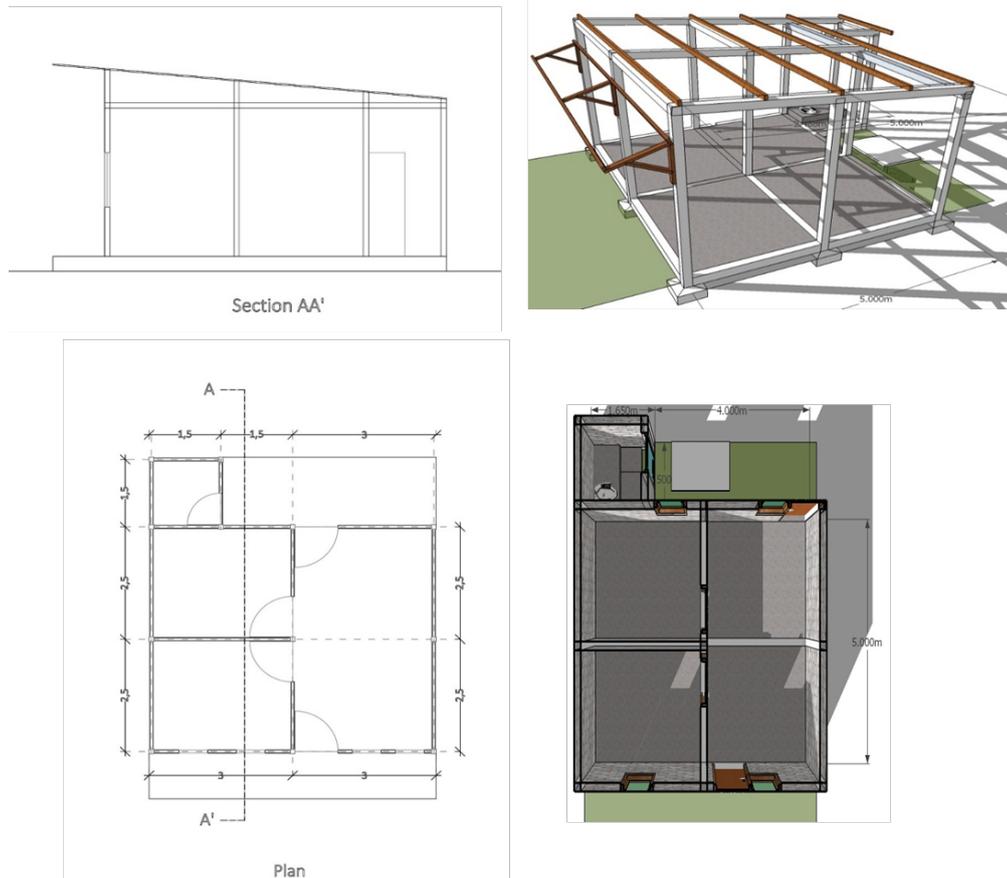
2-D and 3-D floor plan (all dimensions in meter) of self-build low-cost house in Batam, Indonesia
